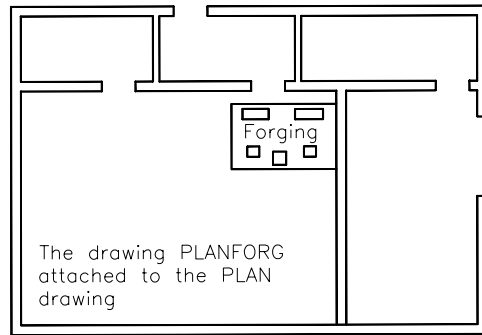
The PLAN drawing after attaching the PLANFORG drawing
